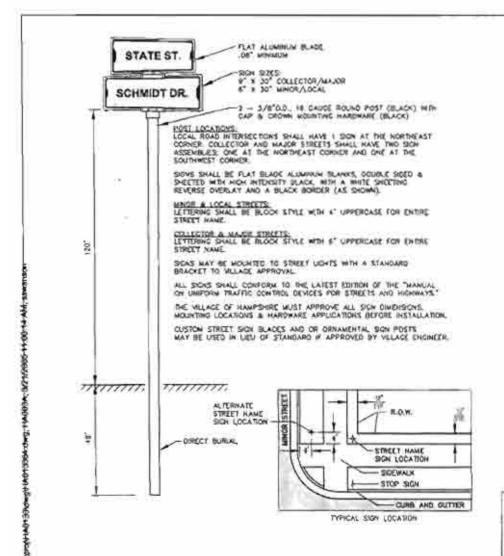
EXHIBIT "J" STREETLIGHT AND STREET SIGN DETAILS
